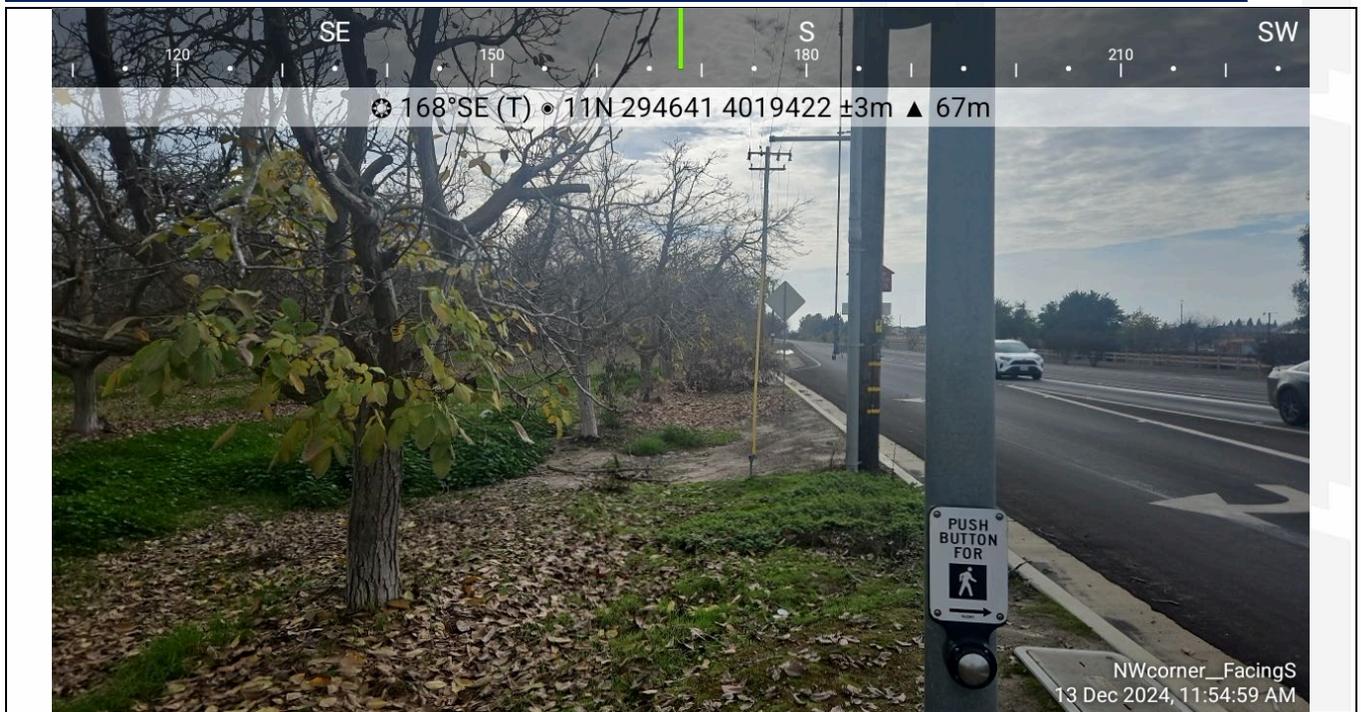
View of site conditions on the northwest corner of the project area facing south.
